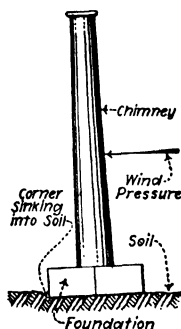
Leeward corner of foundation sinking under wind pressure.
